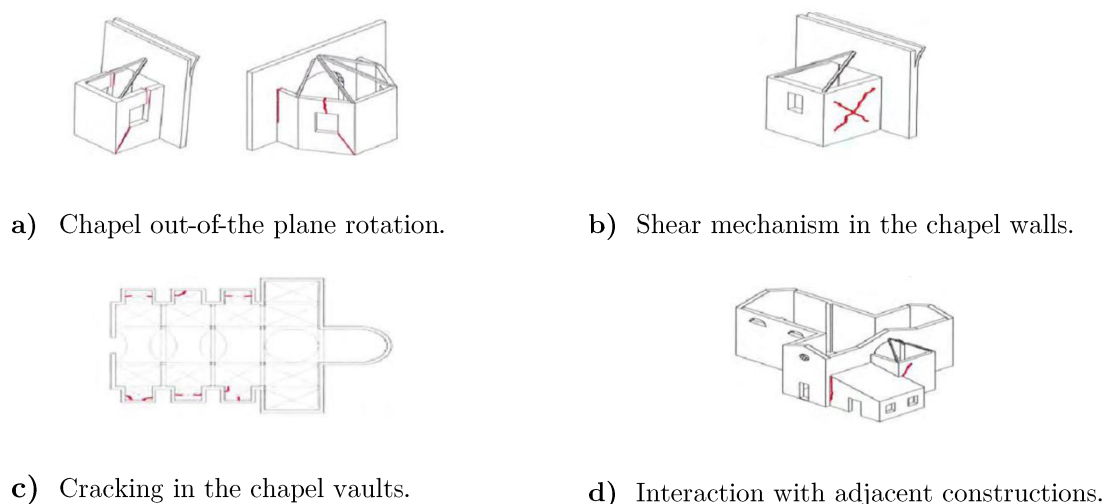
Roof damage mechanisms (LineeGuida 2006).
